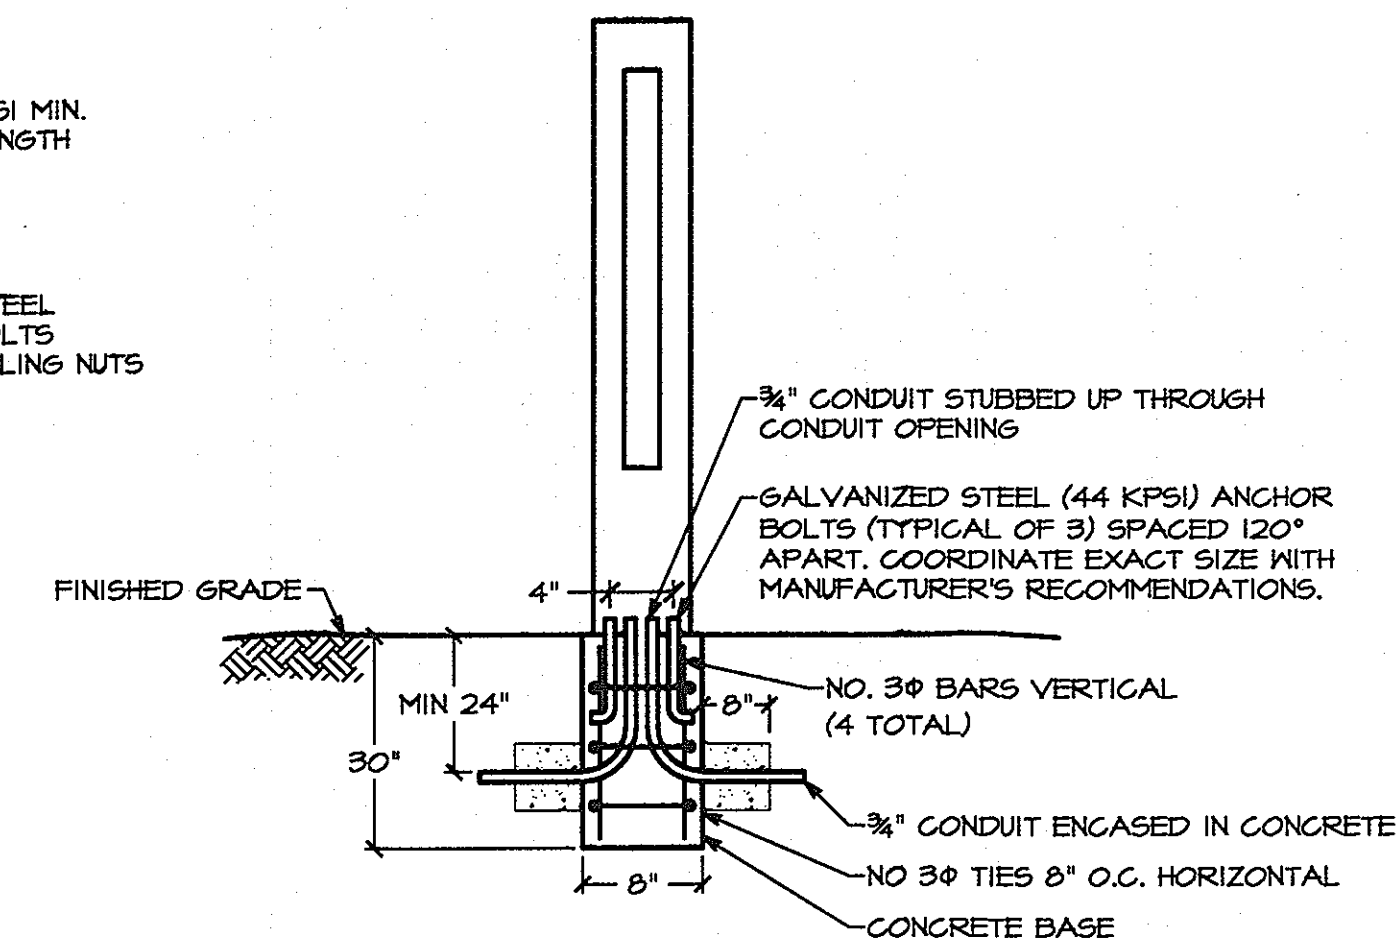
DETAIL - DIRECT BURIAL CONDUIT INSTALLATION
